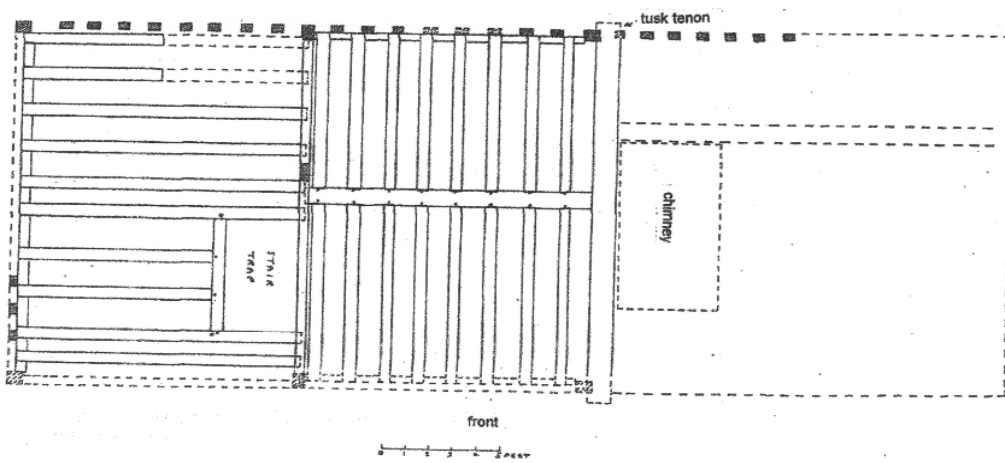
Butlers Farm, Wrabness, medieval hall house, joist plan of parlour and inserted floors in hall and service end
